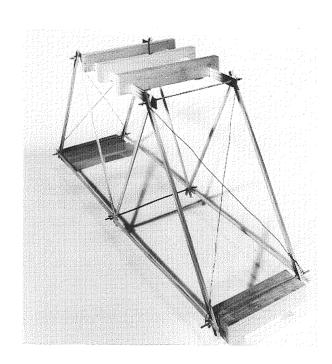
Assembled structure, resting on support blocks, with loading frame and wire cross bracing in place. (Photo courtesy of USDA Forest Products Laboratory)
